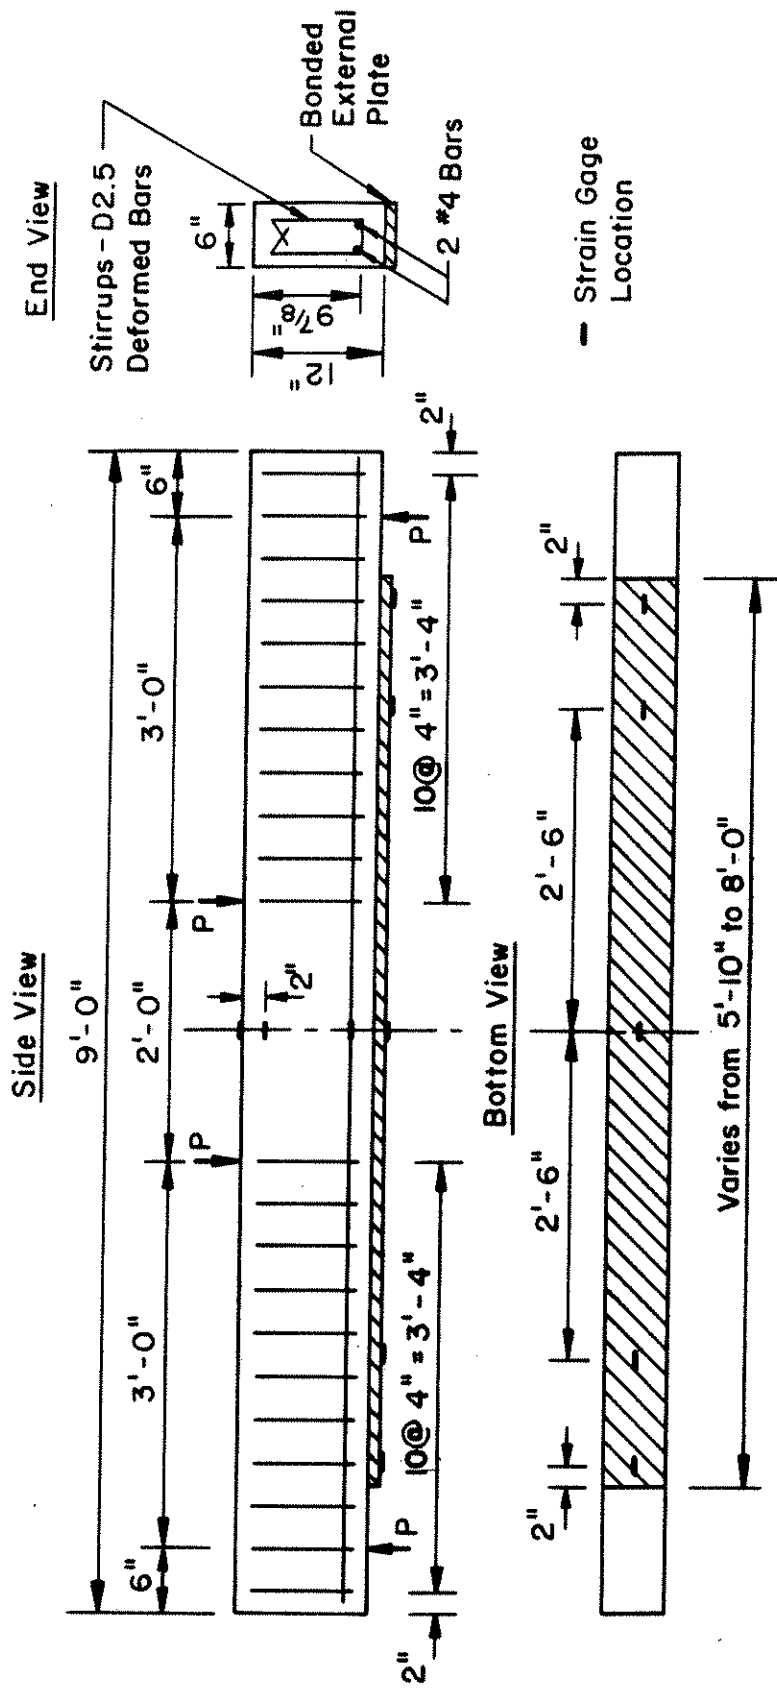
Beam dimensions, internal reinforcing, strain gage locations, and load configuration
